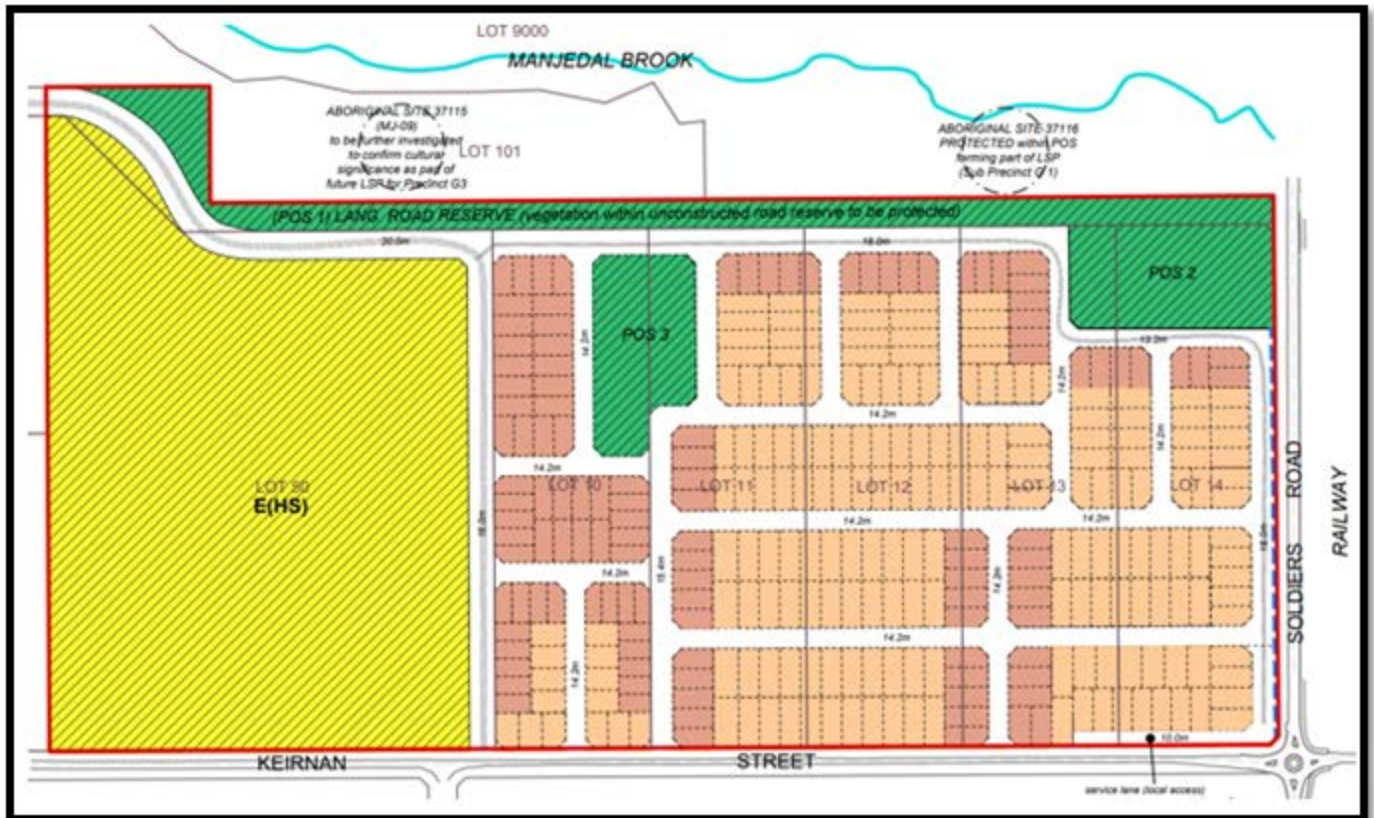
Concept plan of the recommended location of the new local park (POS 3).
